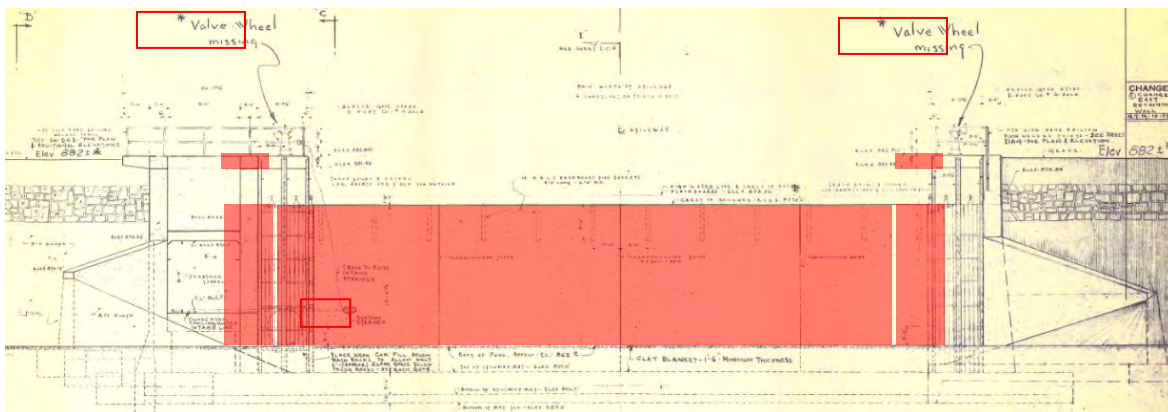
Spillway and Gates - Elevation Looking Downstream
